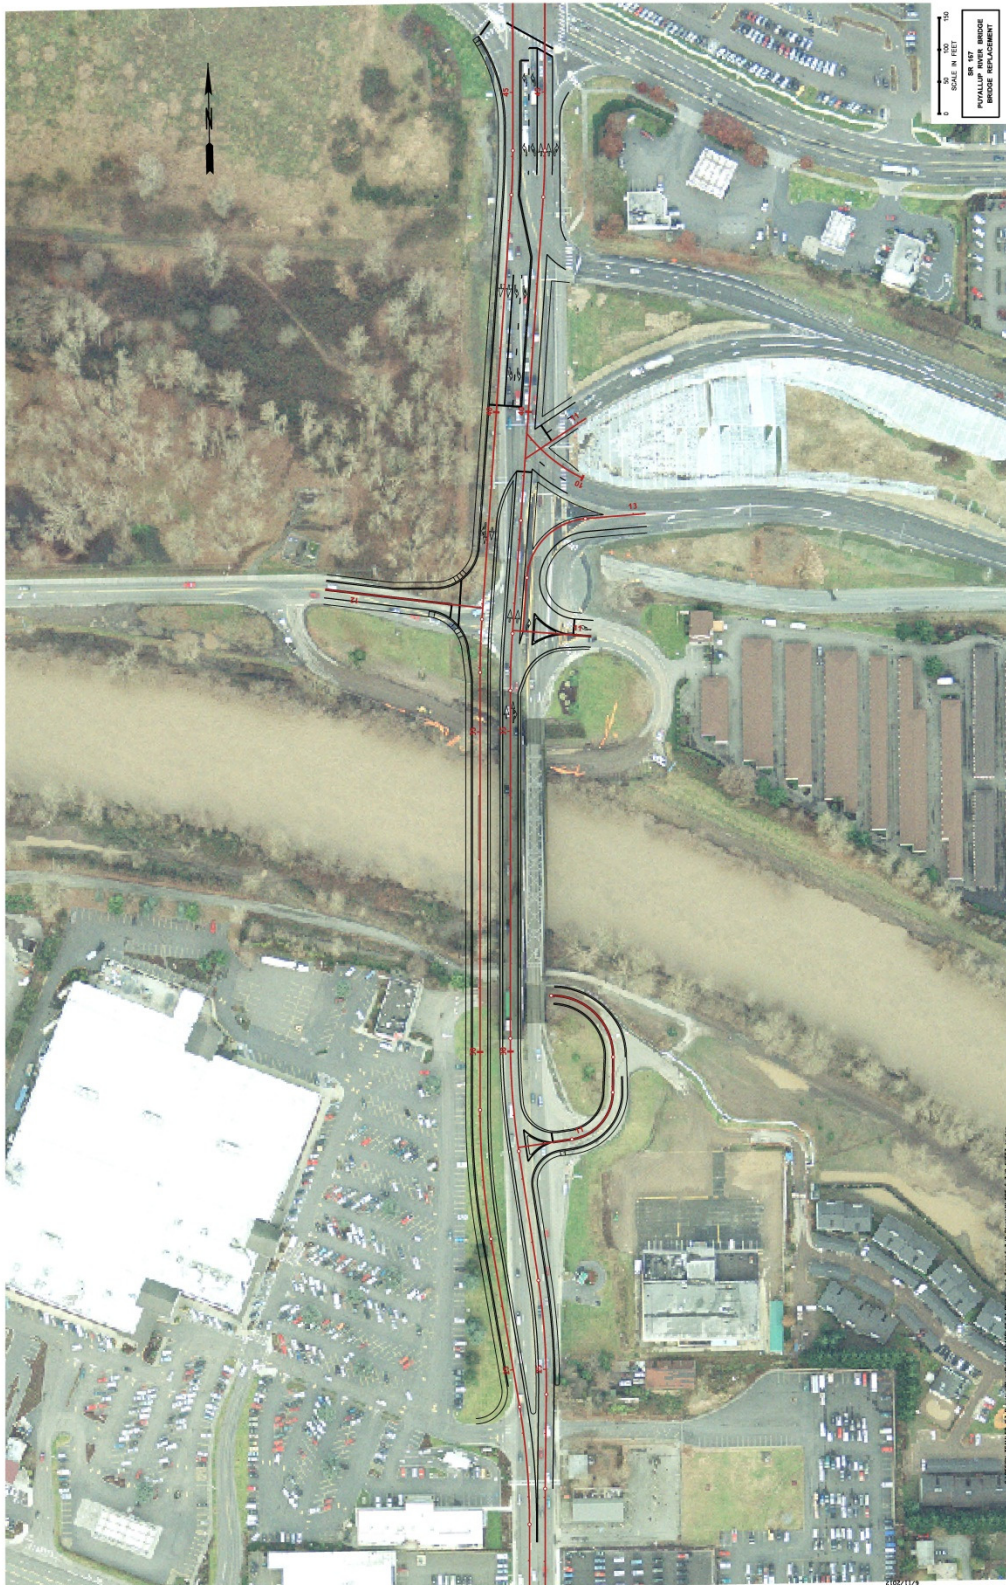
Aerial View of Proposed Puyallup River Bridge Replacement Channelization
